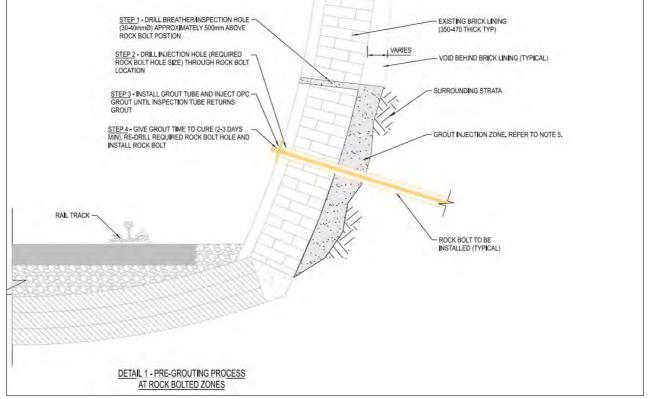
TYPICAL SECTION SHOWING PRE-GROUTING PROCESS AT ROCK BOLTED ZONE. (SOURCE: AURECON/VLINE)
